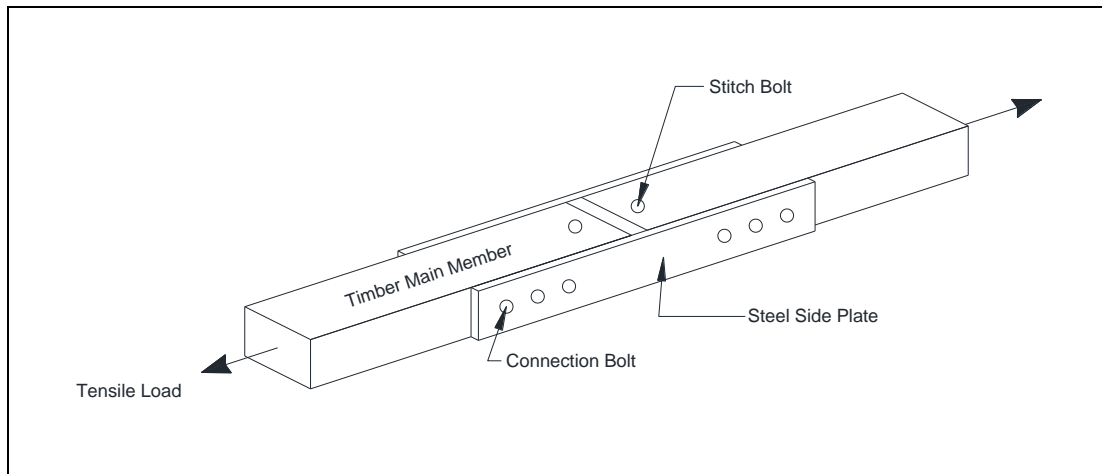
Tensile timber main members connected by bolted steel side plates. Stitch bolts are placed perpendicular to the connection bolts.
